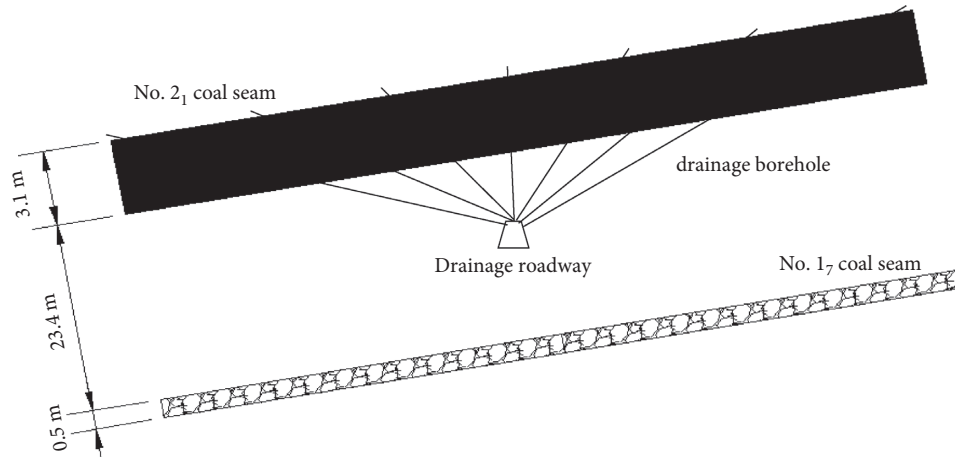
The layout of the drainage borehole for the drainage roadway.
